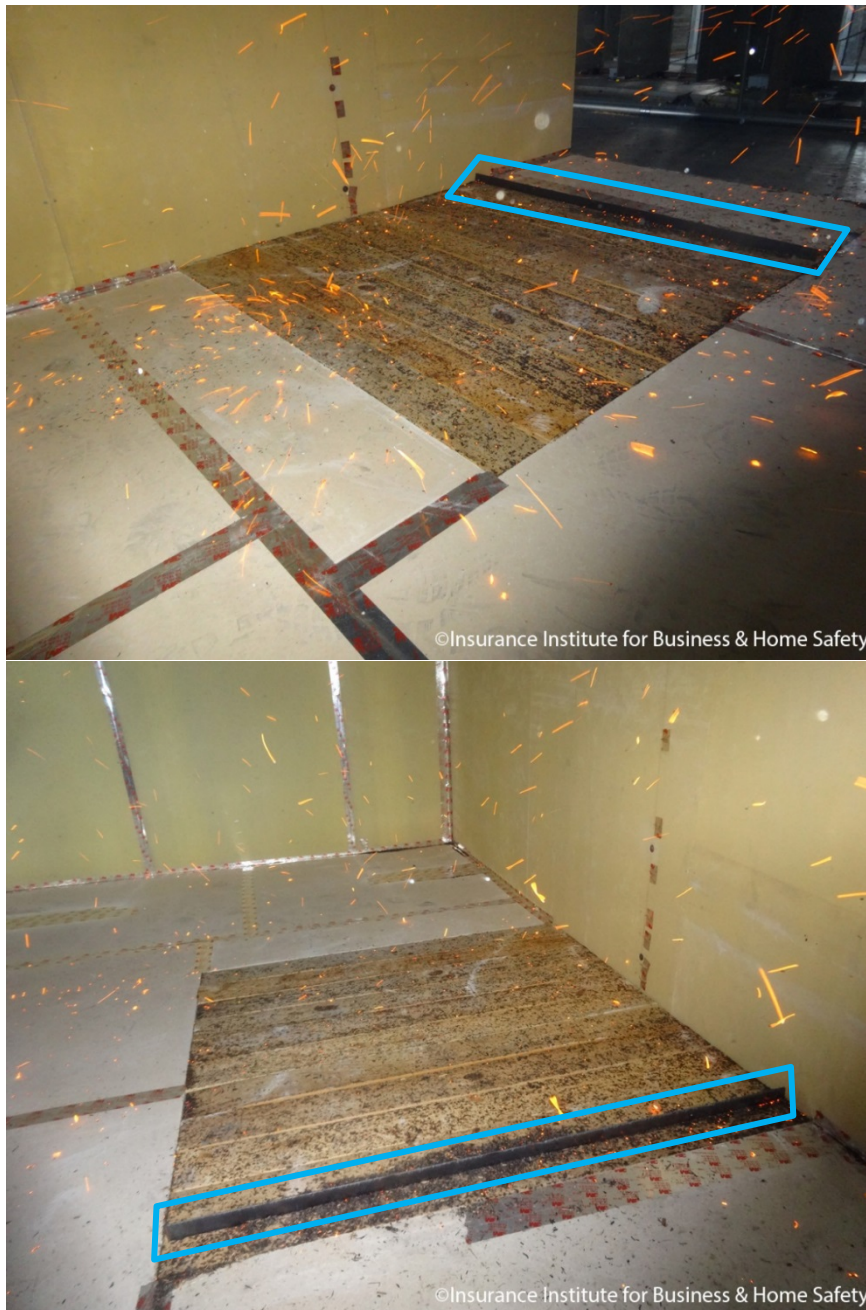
Test deck with metal bar inserted in gap between deck boards; view toward fan array (top) and view toward test building (bottom).
